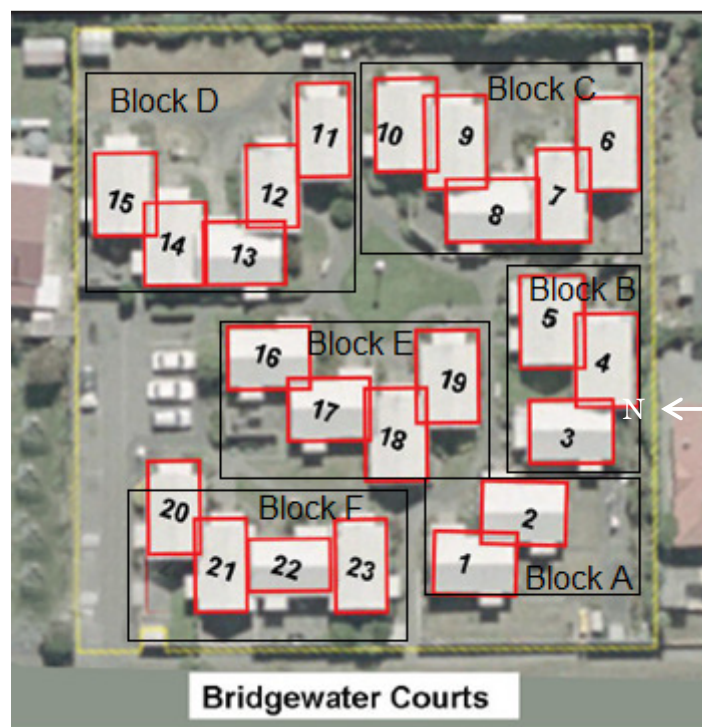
Site plan of Bridgewater Courts Housing Complex.
